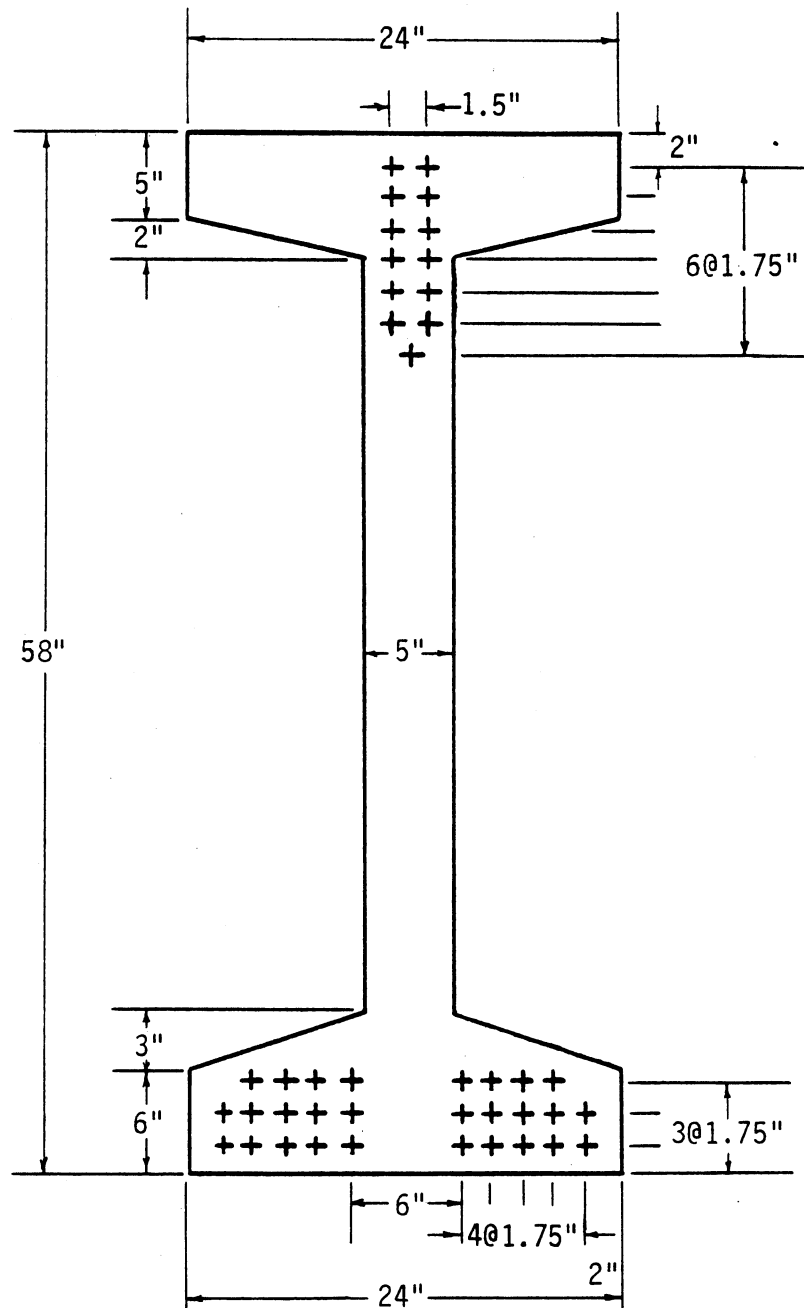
Cross section of WSDOT series 10 pretensioned concrete girder.
